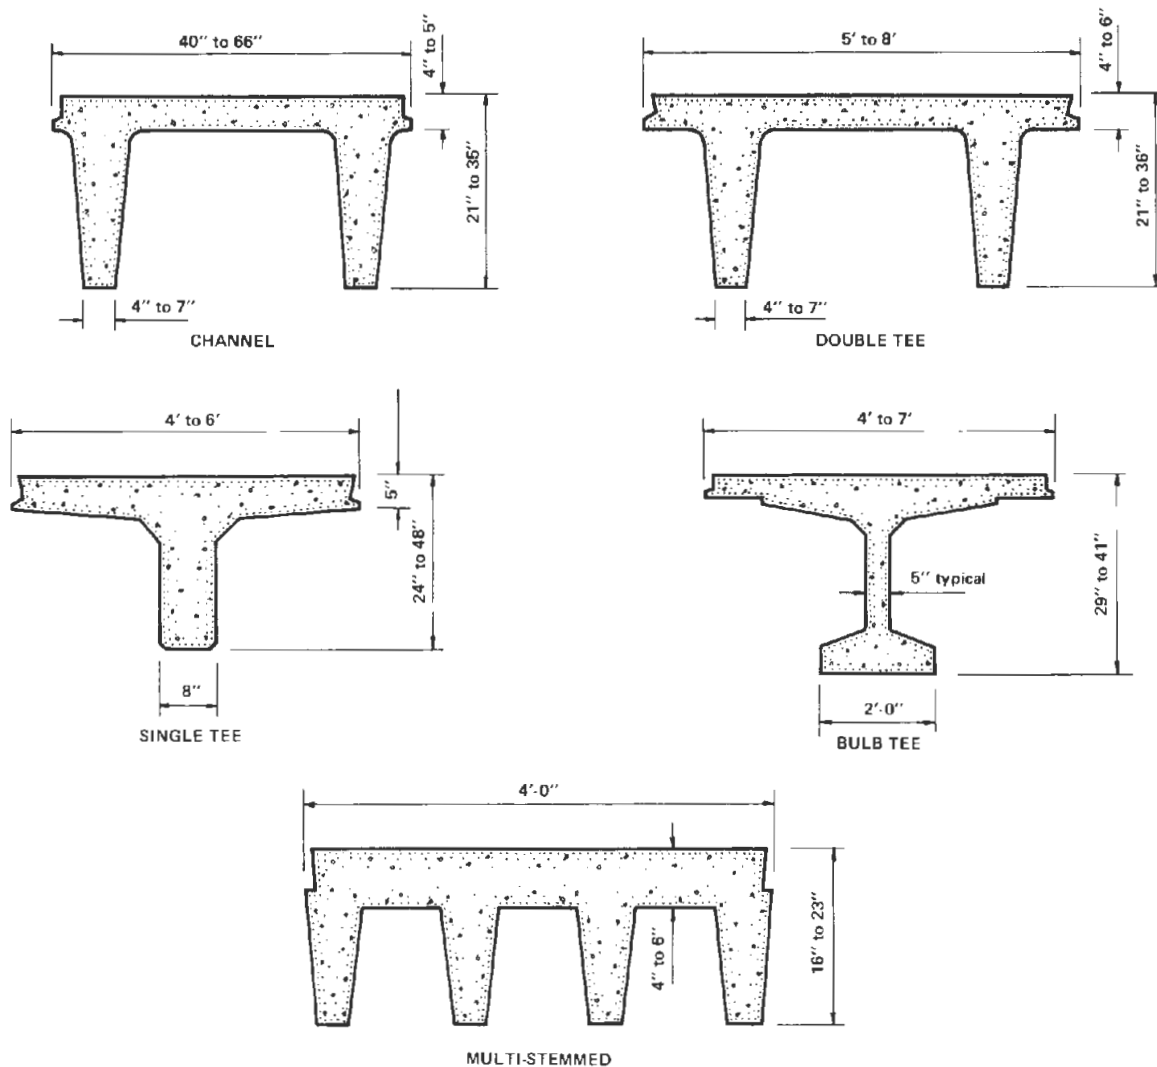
Typical precast, prestressed concrete bridge sections produced by U. S. and Canadian manufacturers. (Courtesy Prestressed Concrete Institute)
